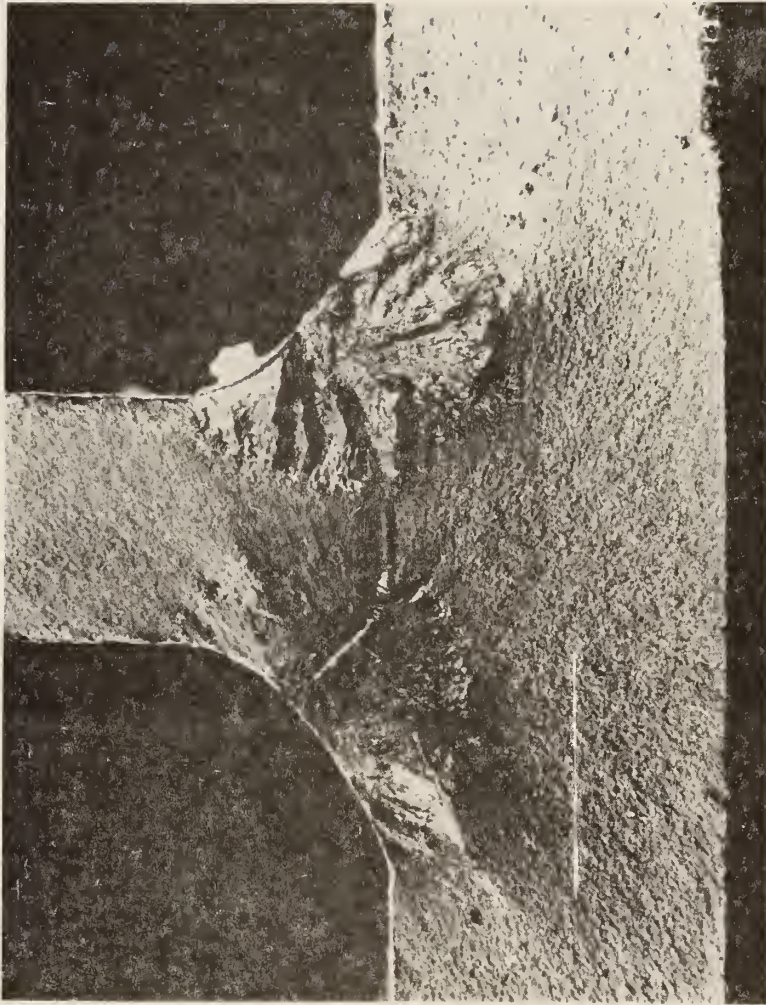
Fatigue crack after destroying flange of welded beam.
